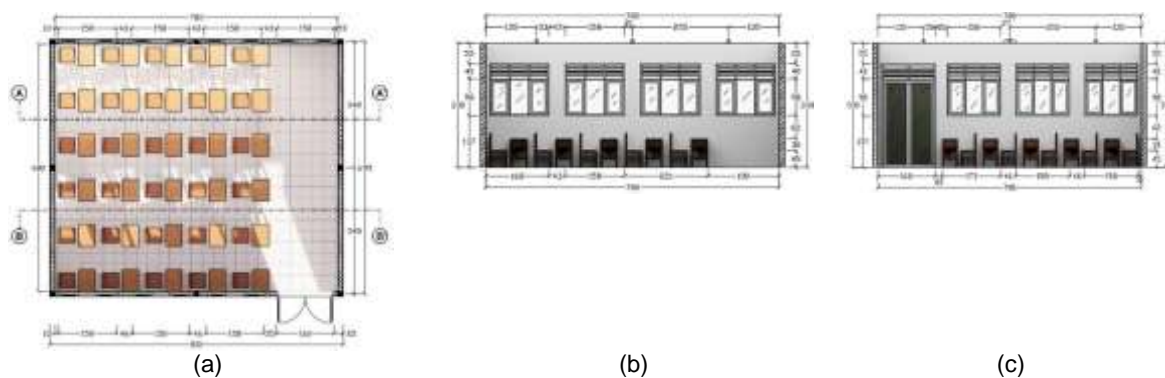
XII Nursing 2 Classroom (a) Layout, (b) Section A–A', and (c) Section B–B'
